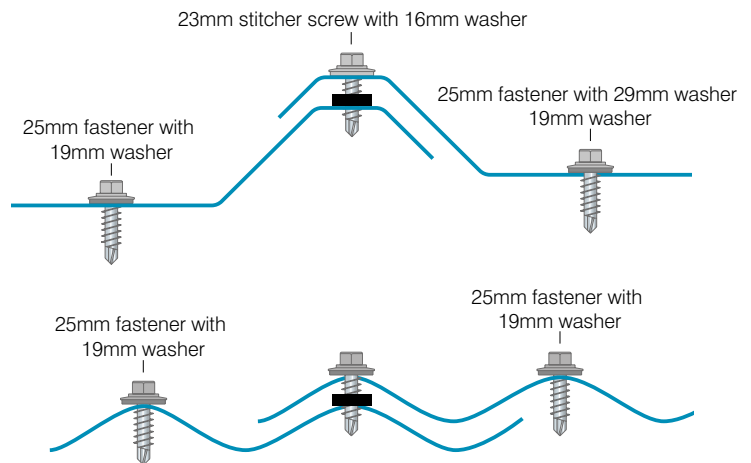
End lap fixing details – roof profiles (Sheeting laps)
